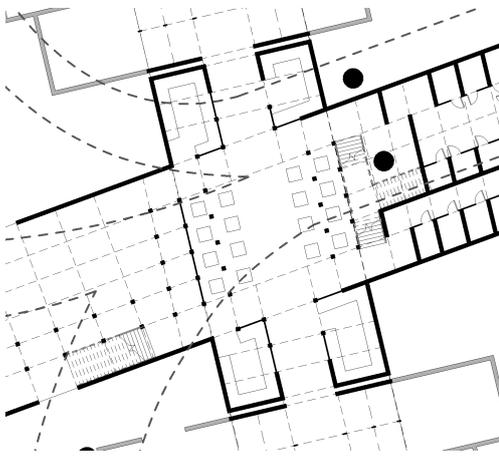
Floor plan of the games area. Fragment taken from Figure 16.
